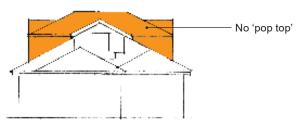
C.6-1: No 'pop top' roofs visible from public domain.
